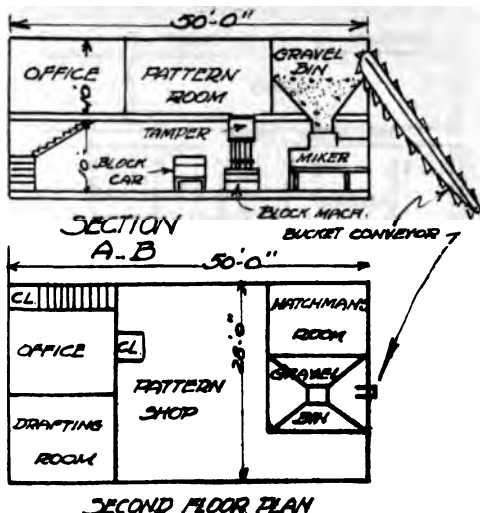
SECTION AND SECOND FLOOR PLAN, PLANT NO. 5
